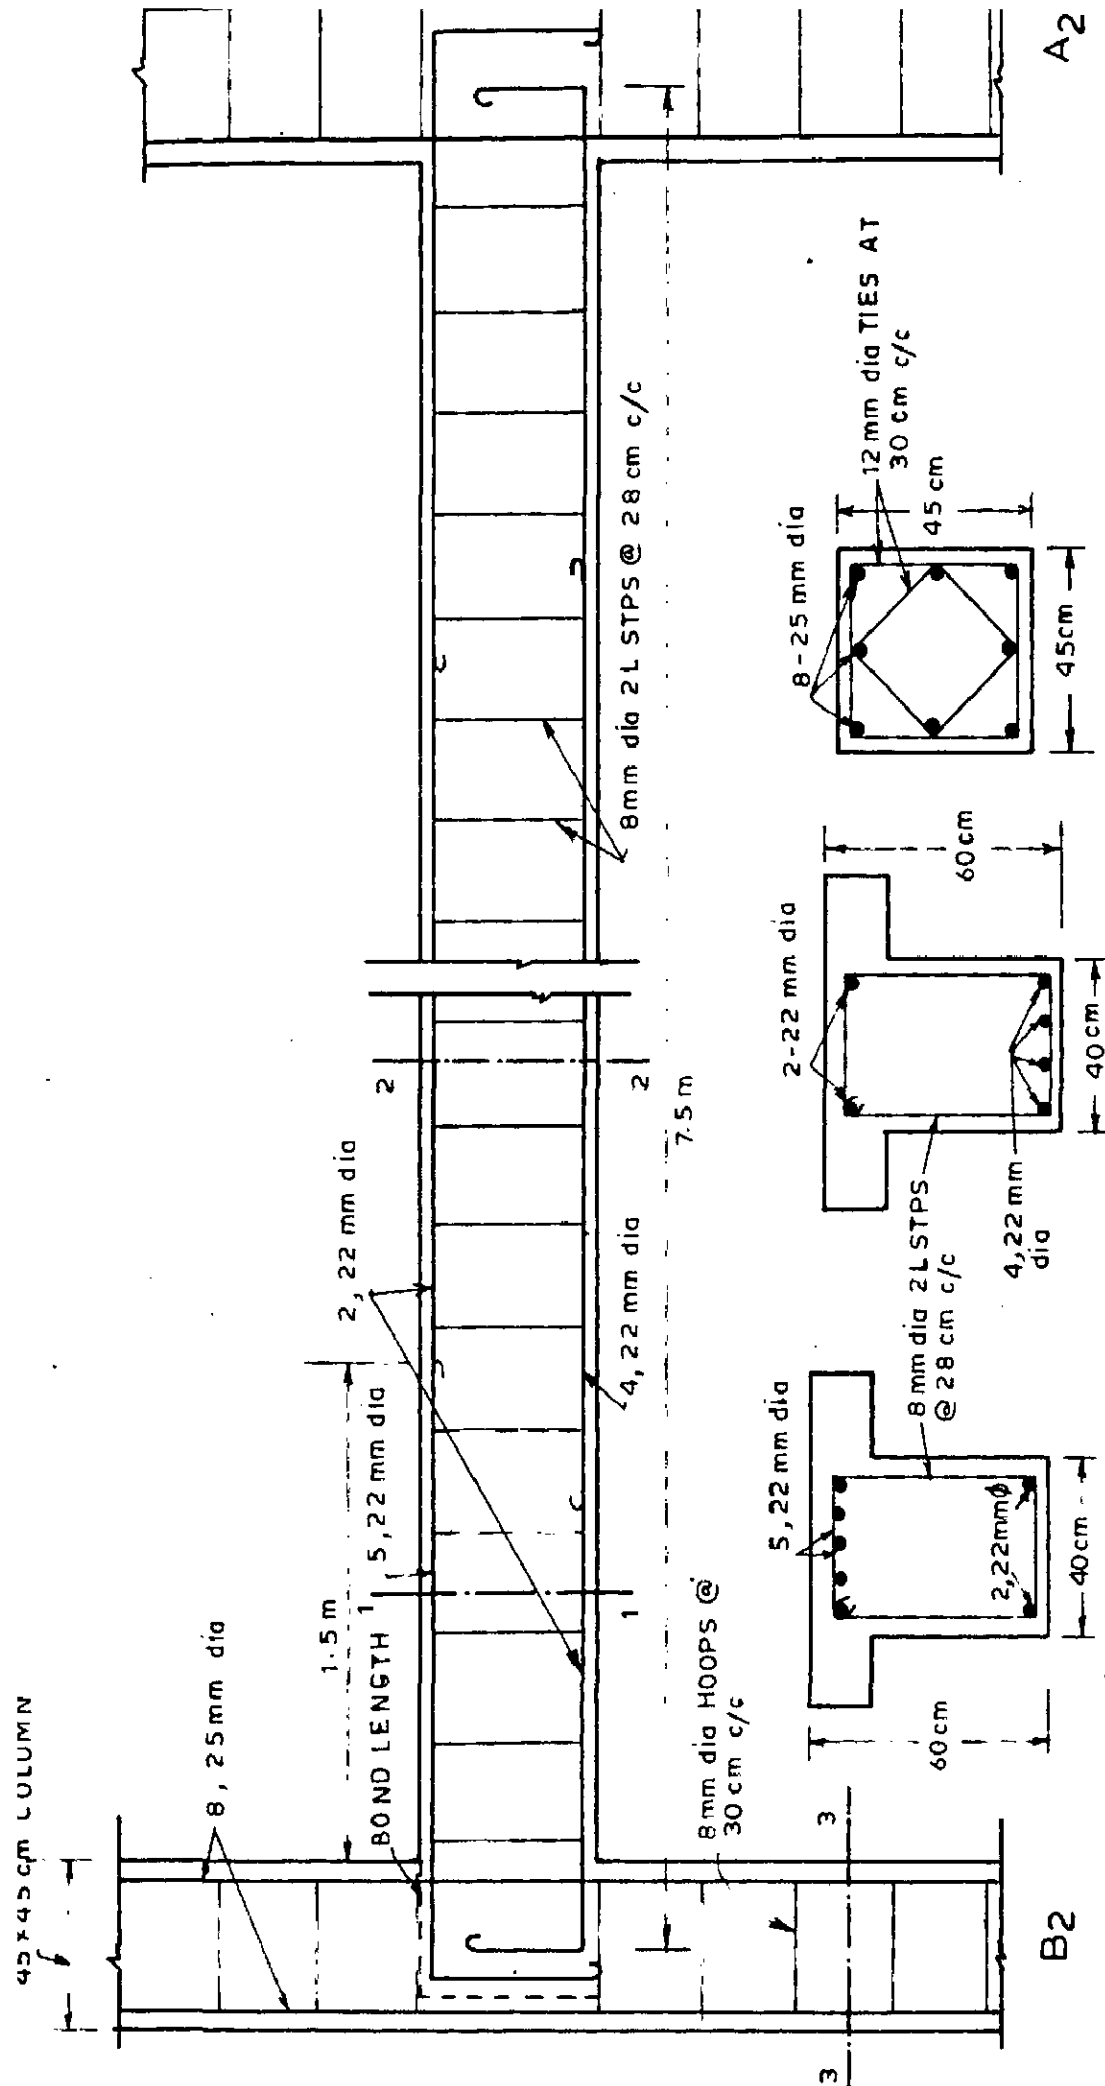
DETAILS OF FRAME A₂- B₂ AT FIRST FLOOR LEVEL
